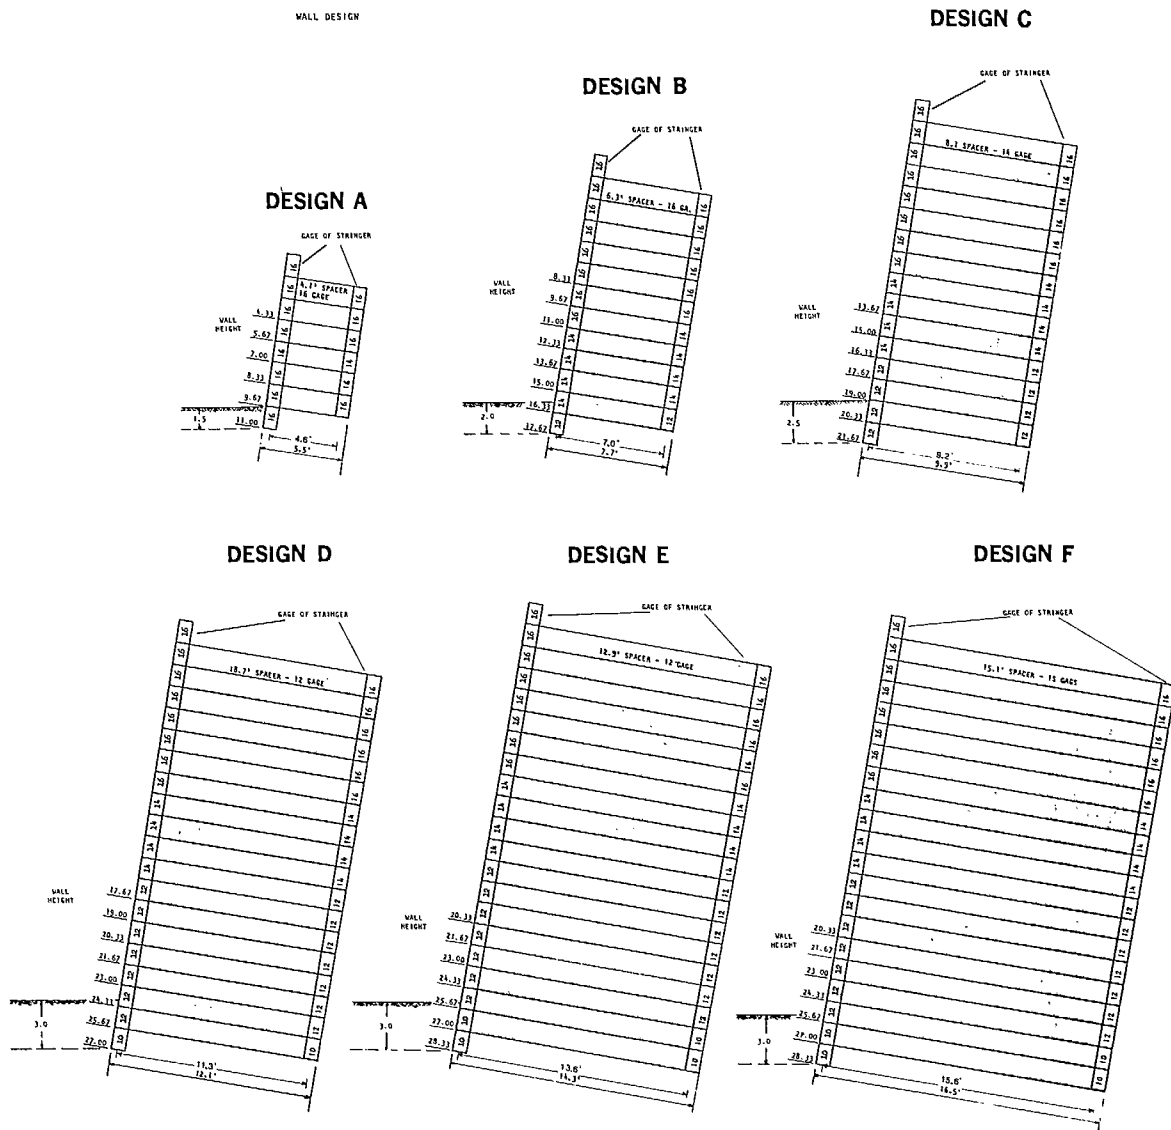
Typical ratios of thickness to height for Armco, Type 2 walls (19).
